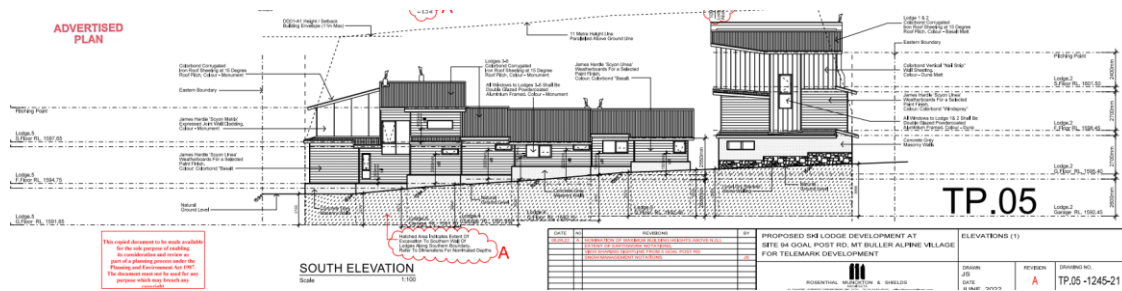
South elevation – 'withdrawn' application for PA2201612 (Source: PA2201612)
